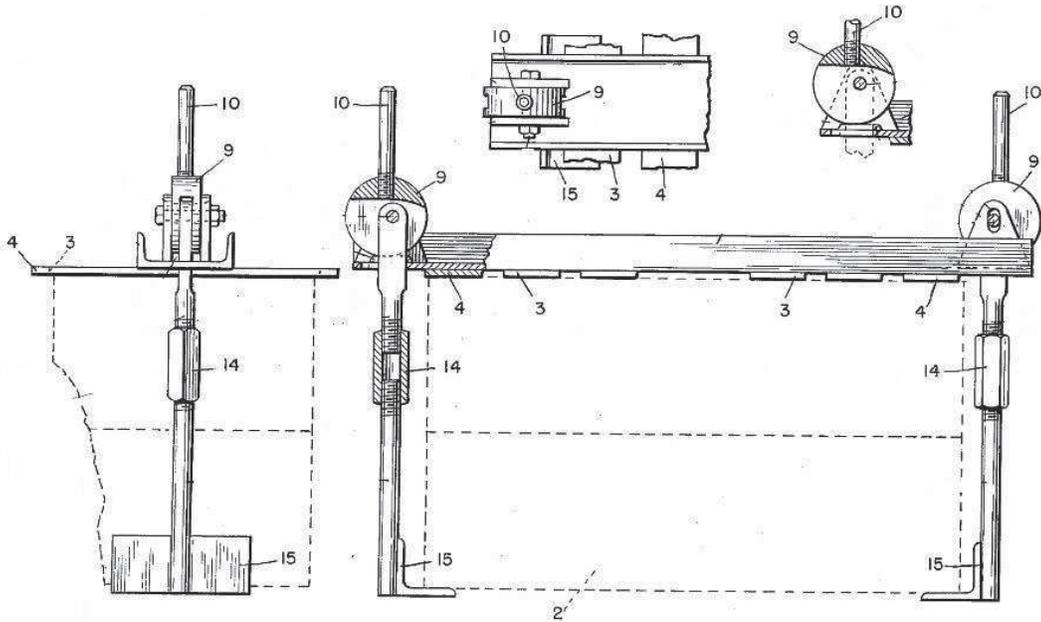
CAM actuated adjustable mold clamp. Source: [6].
